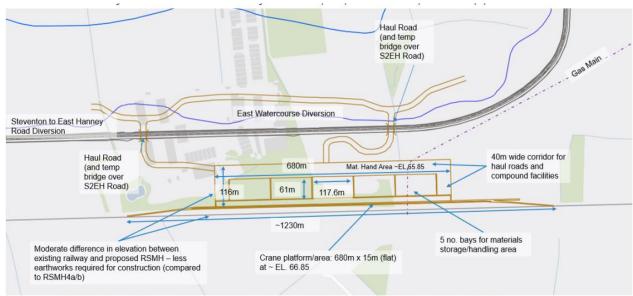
Locations of Rail Sidings and Materials Handling Area Options
